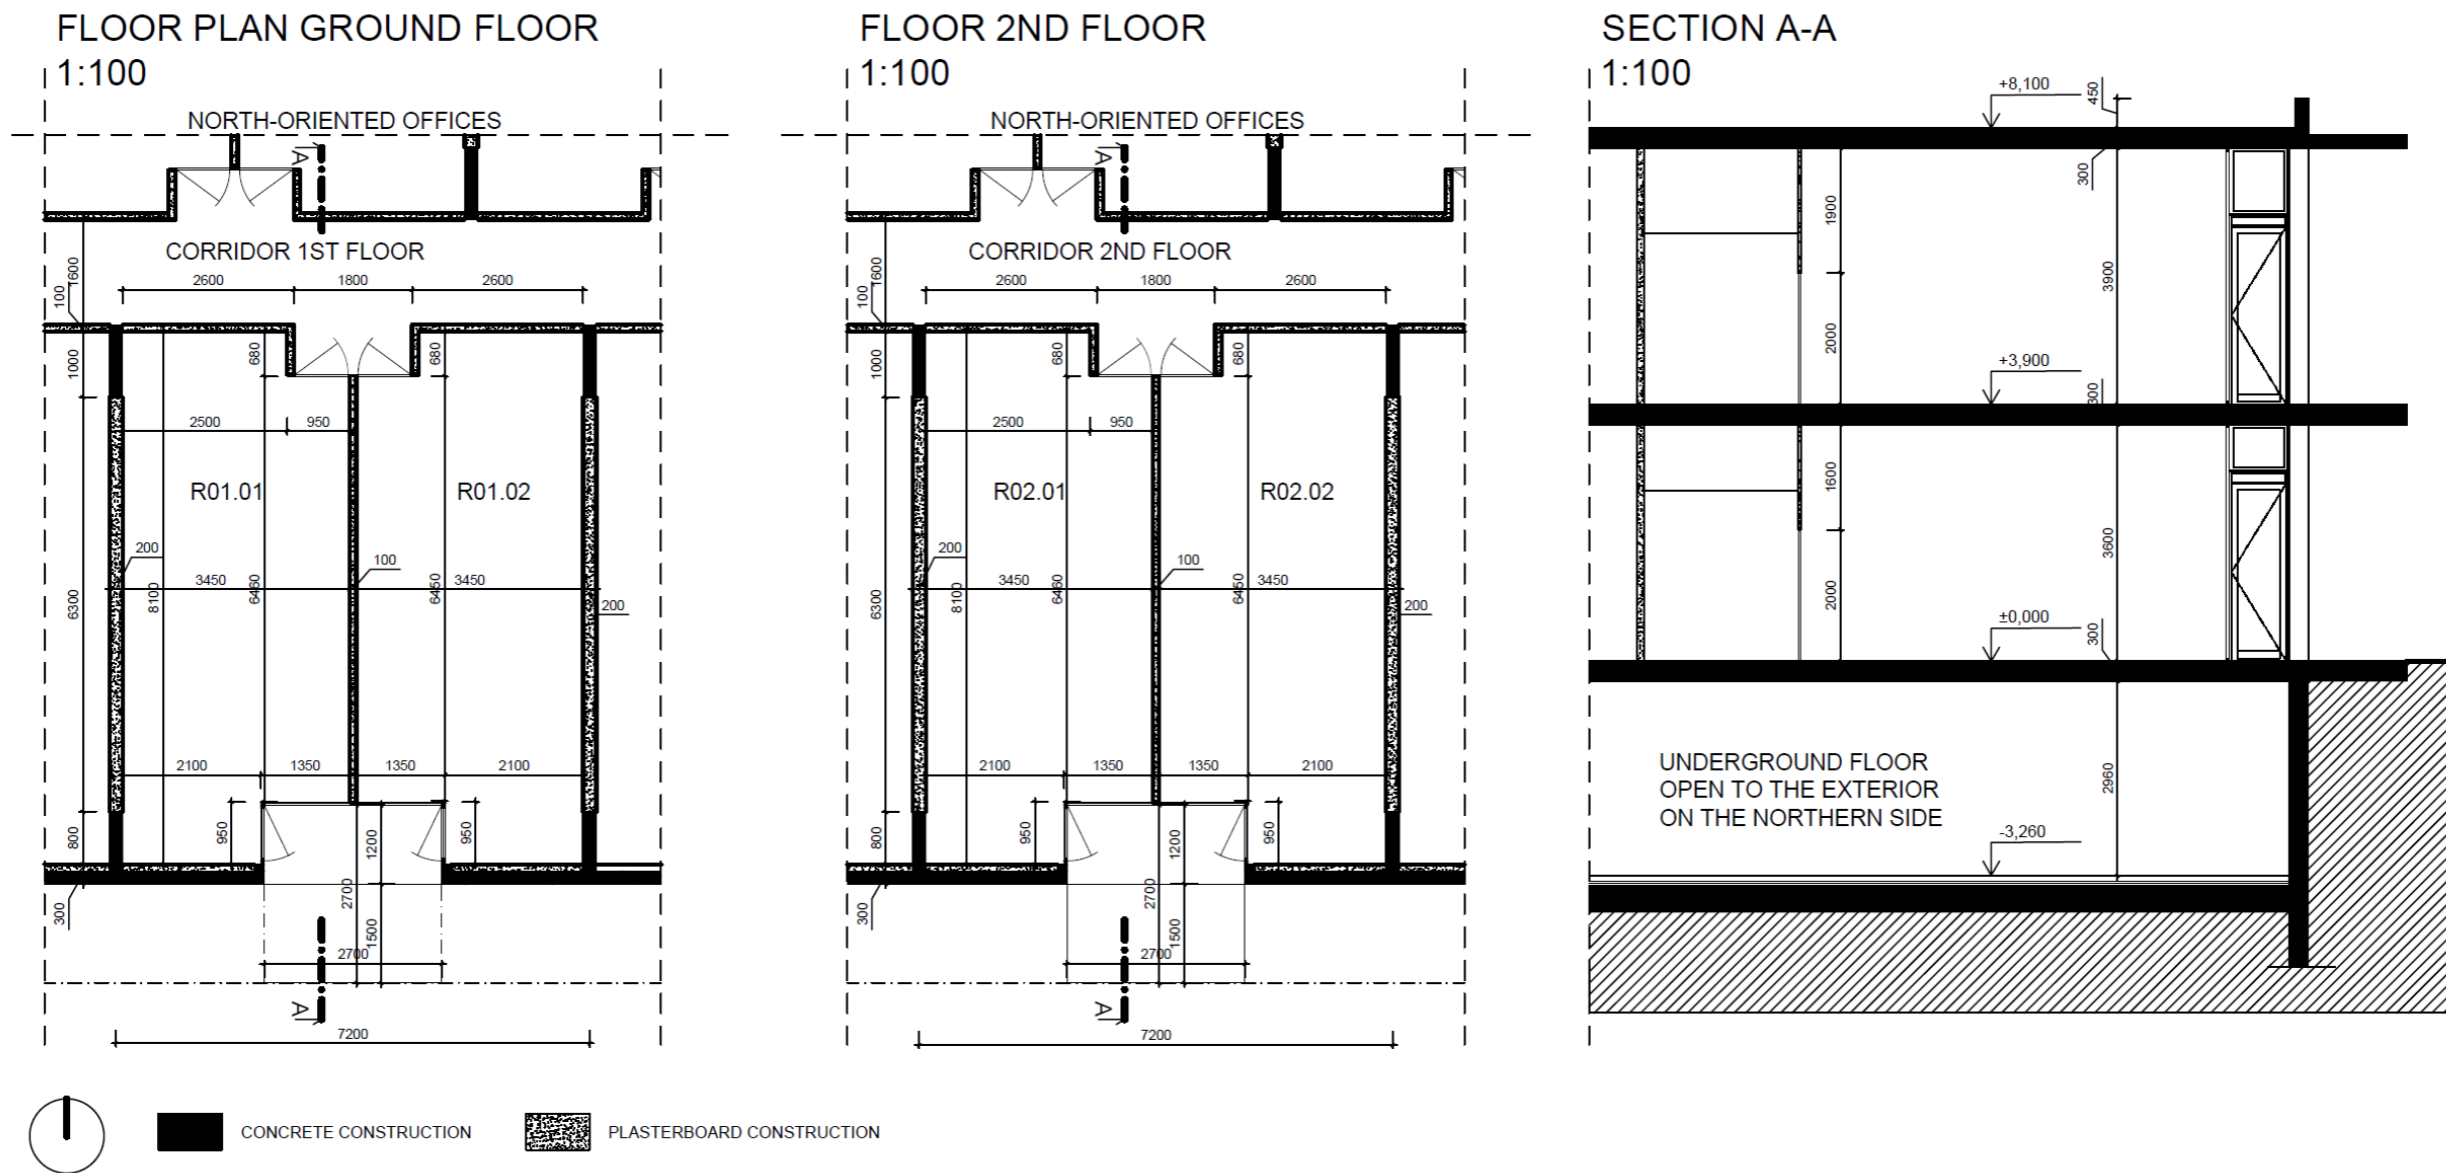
FLOOR PLANS AND SECTIONS OF ROOMS BEHIND THE POWERSKIN+ INSTALLATION
